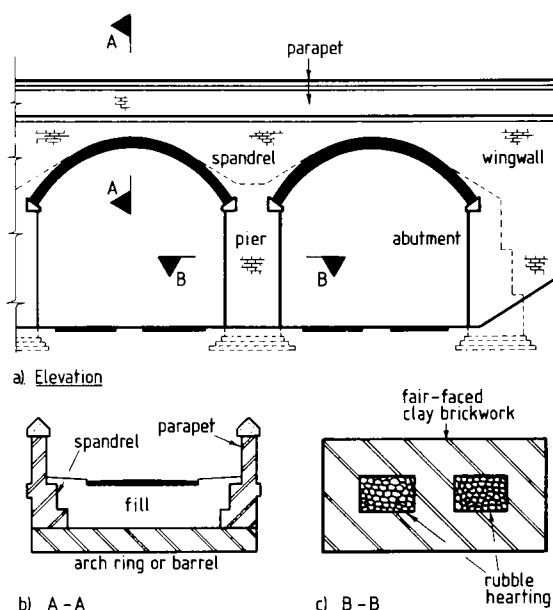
Typical brickwork arch bridge details: (a) elevation, (b) A-A, (c) B-B.
